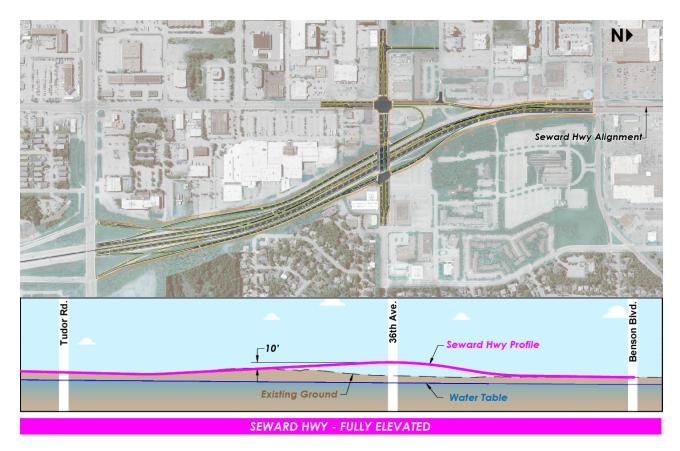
Profile of the Seward Highway elevated over 36th Avenue at grade
